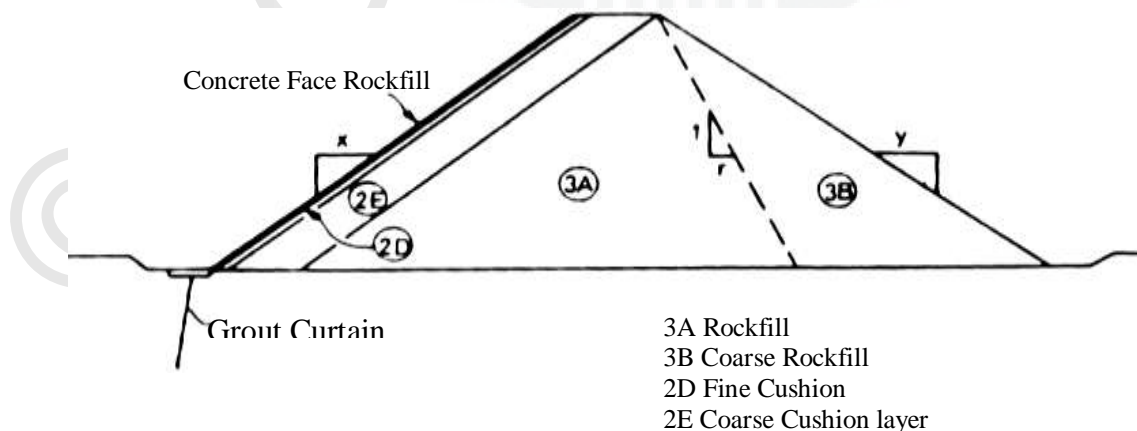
Type of Concrete Face Rockfill Dam (Robin et al., 1992)
